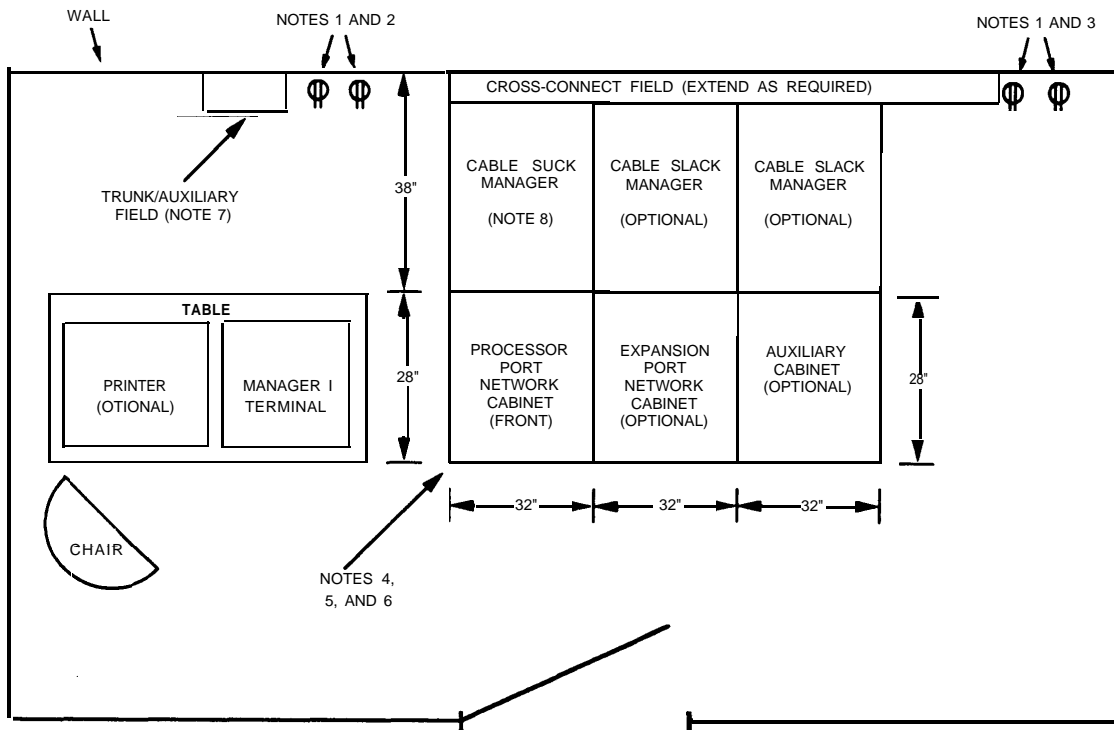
Typical Single-Carrier Cabinet Floor Plan
